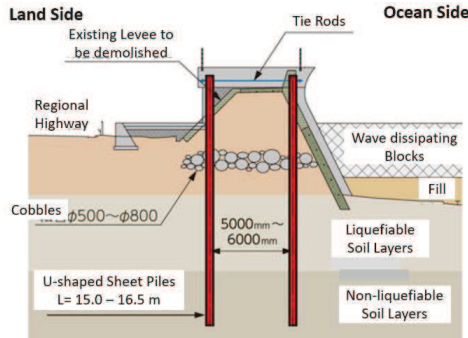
Typical cross section of Kochi Coastal Levee Retrofit Project with double sheet pile walls
